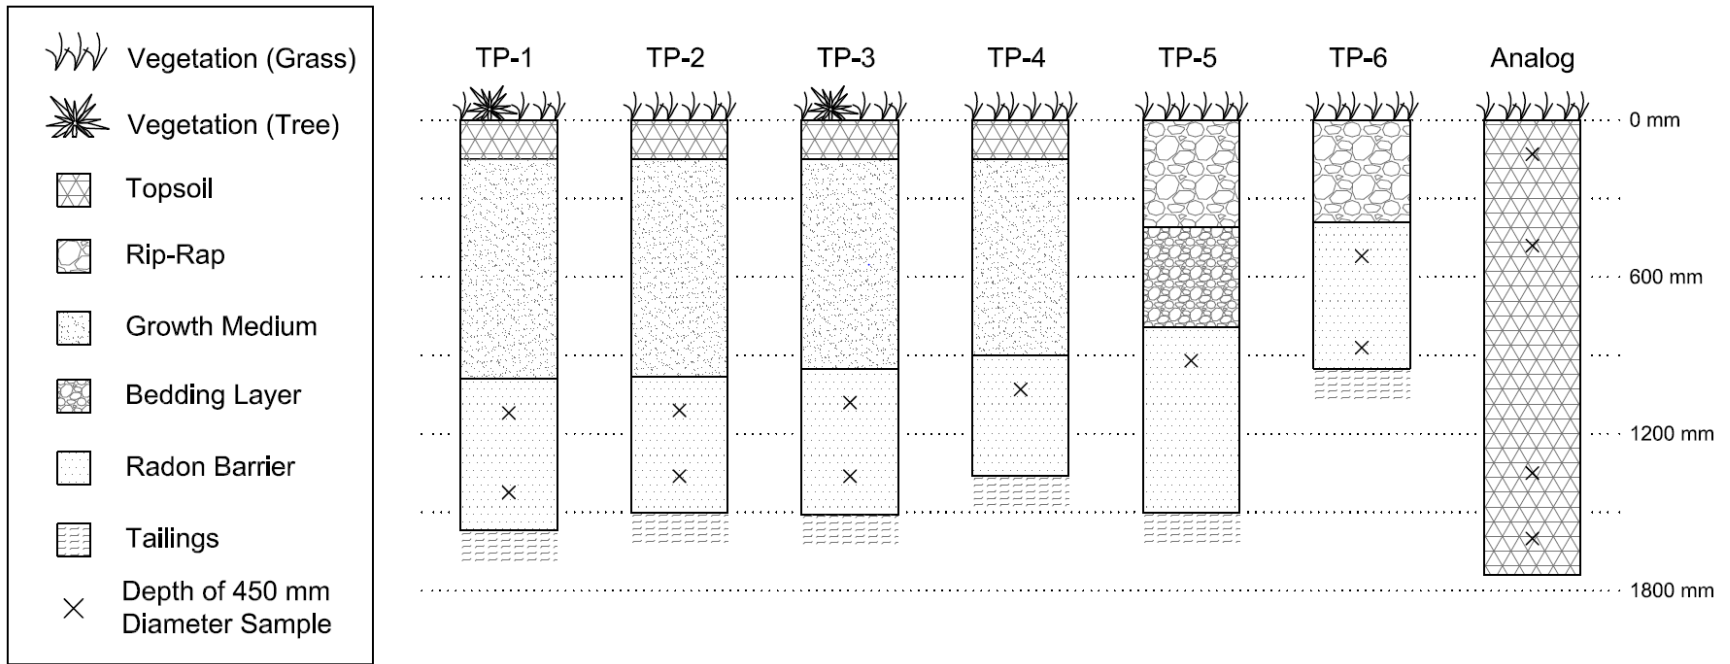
Cover profiles for test pits excavated at the Falls City, TX site in 2016.
